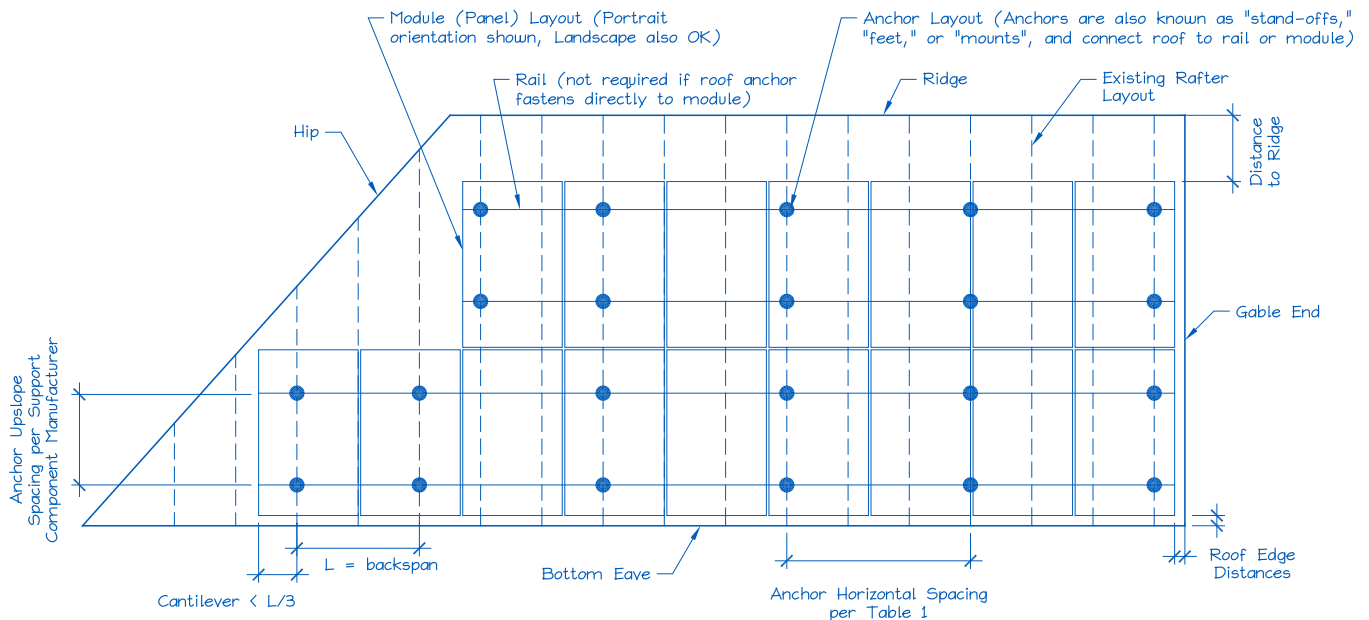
Sample Solar Panel Array and Anchor Layout Diagram (Roof Plan).
